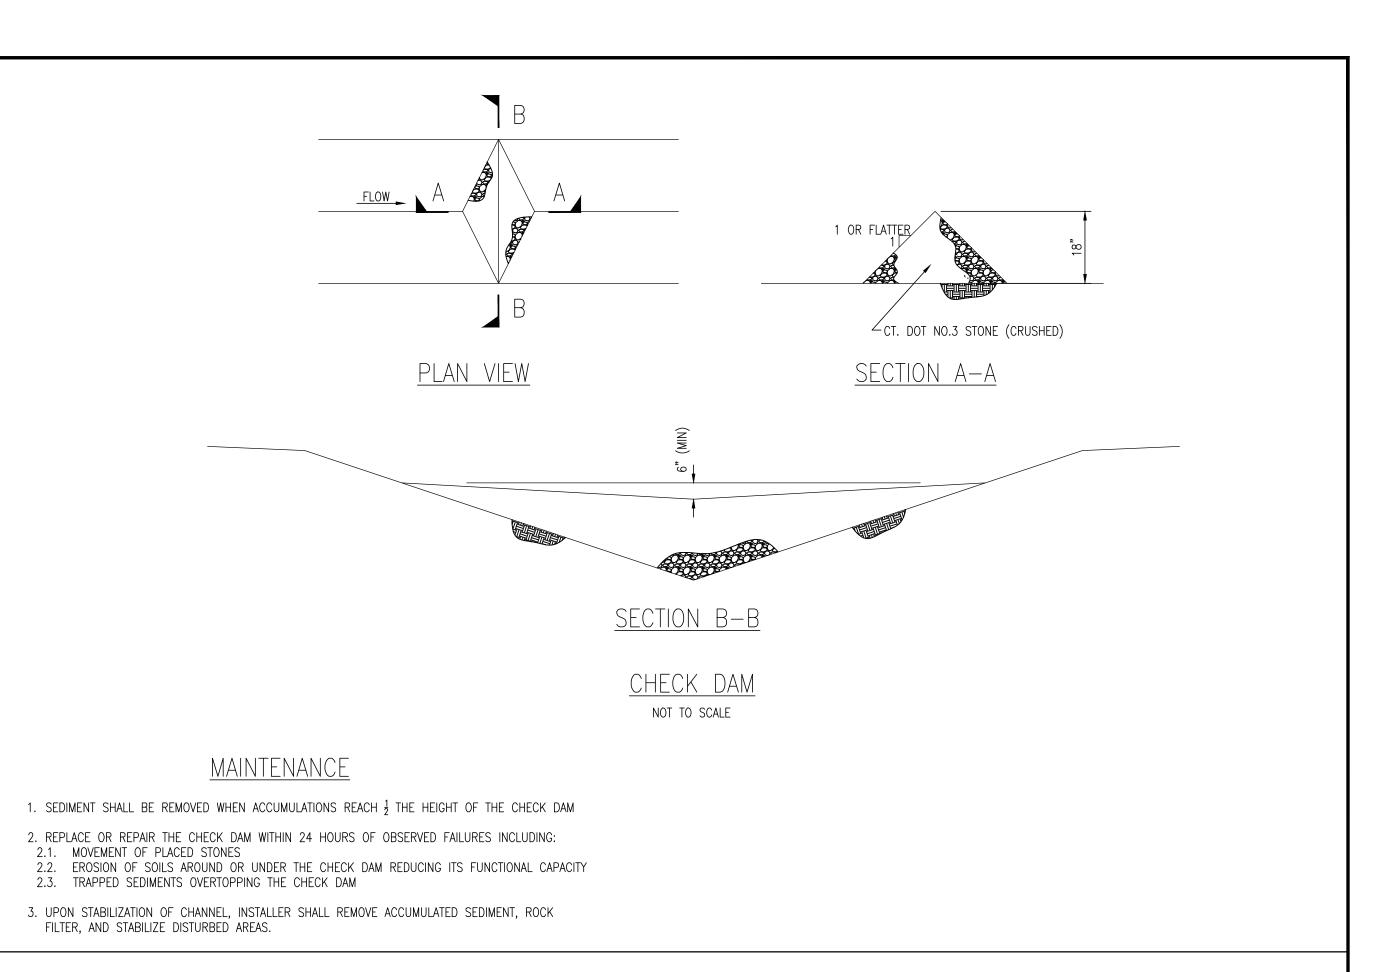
Sediment and Erosion Control Plan & Details Campville Substation
